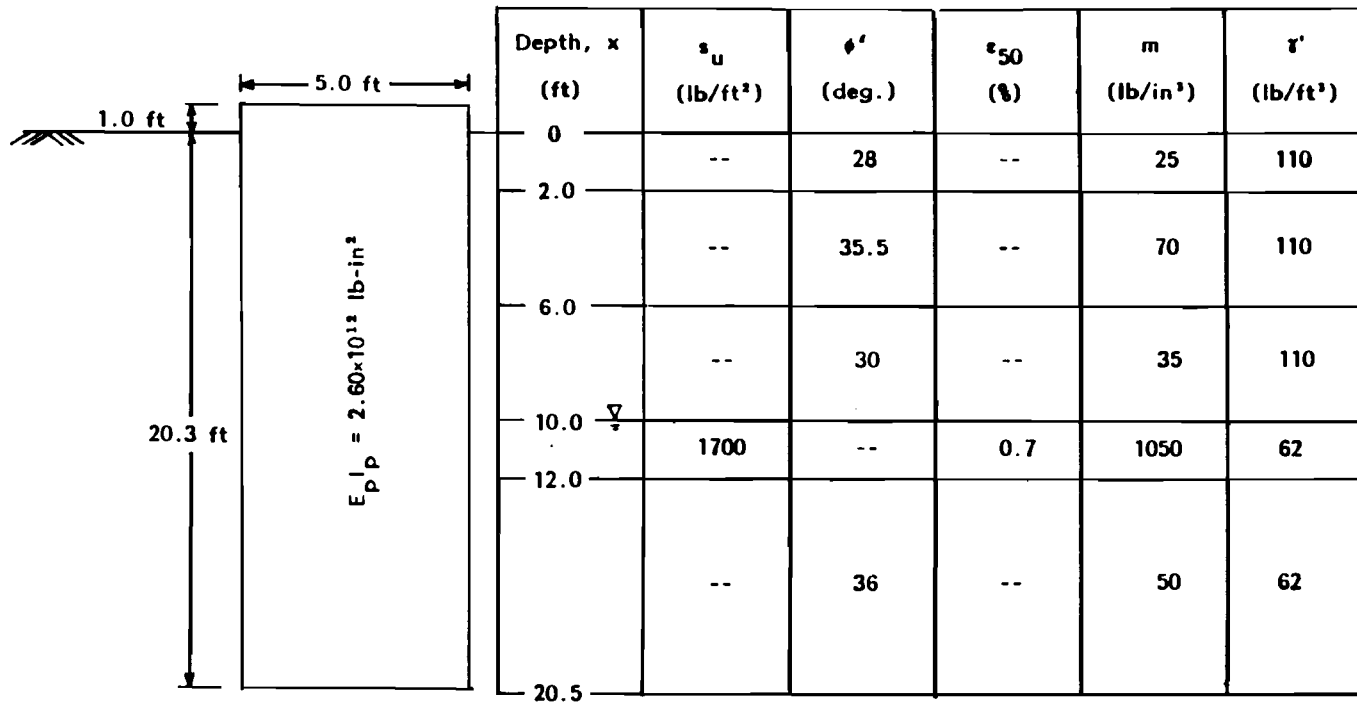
Soil and Drilled Shaft Data Used for COM624 Input, Shaft No. 11.
